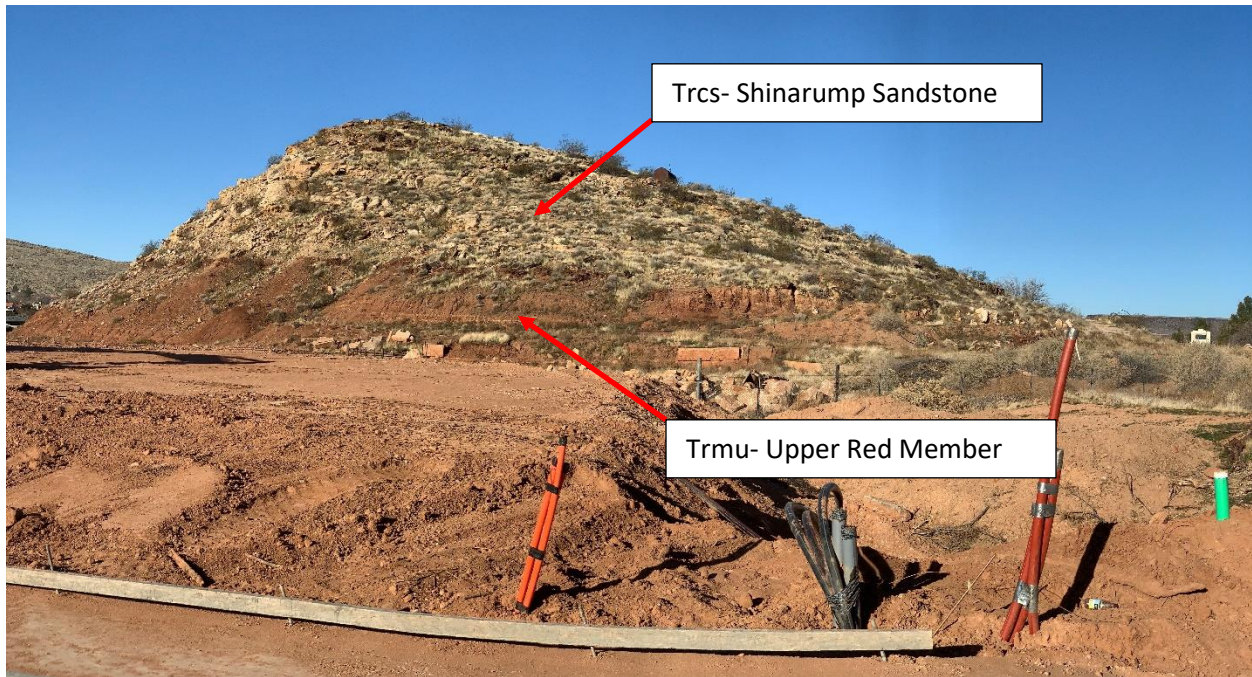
view of Jones Hill looking west to slightly NW.
